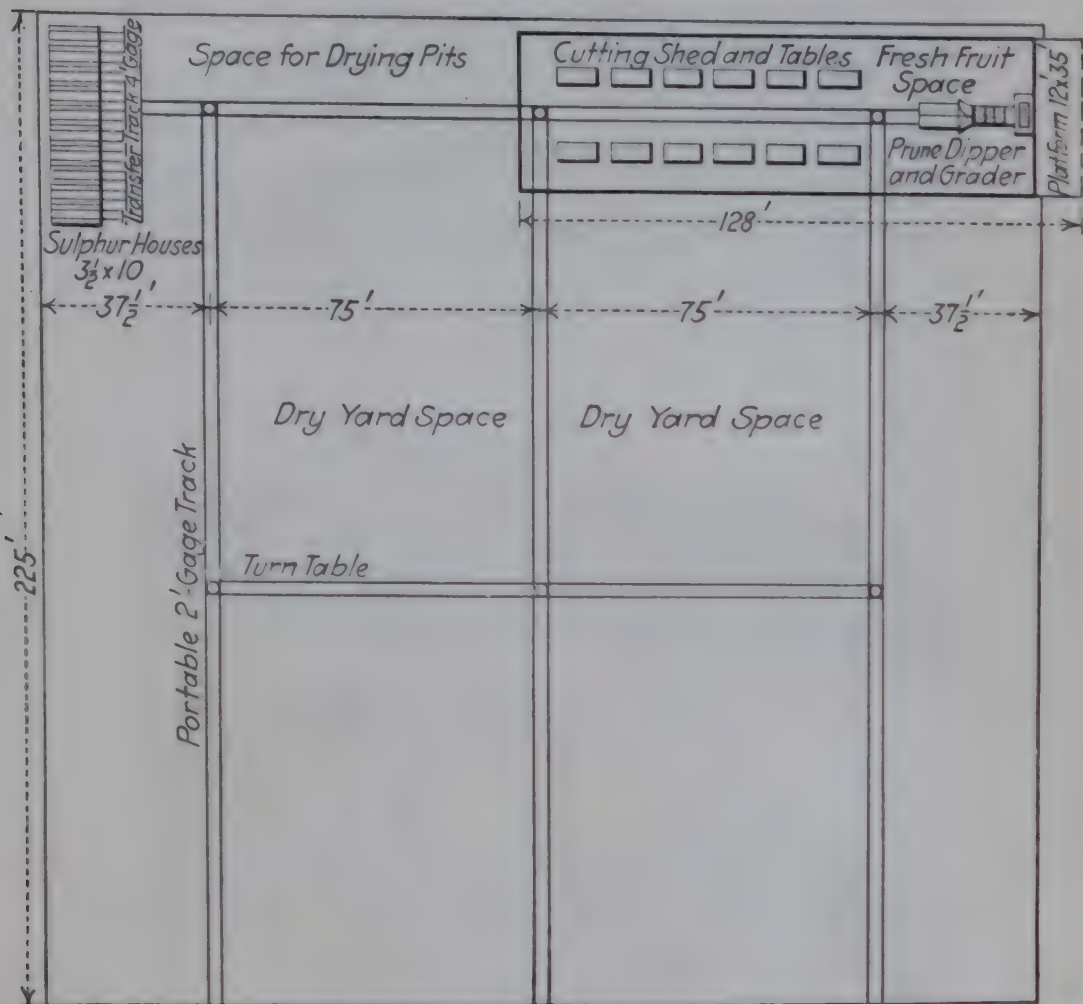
Ground plan of a fruit drying yard of approximately 2½ acres. (After Christie and Barnard.)
